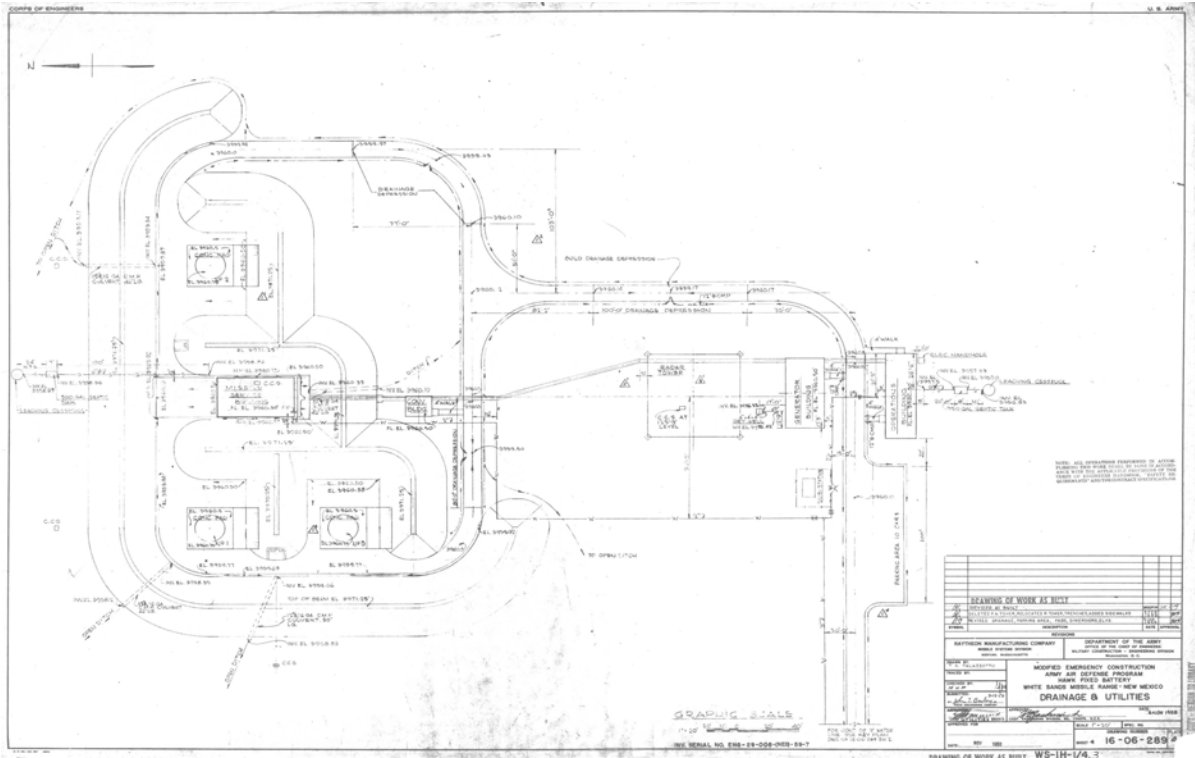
Overview of Hawk Fixed Battery installation from 1959 WS-IH plans.
